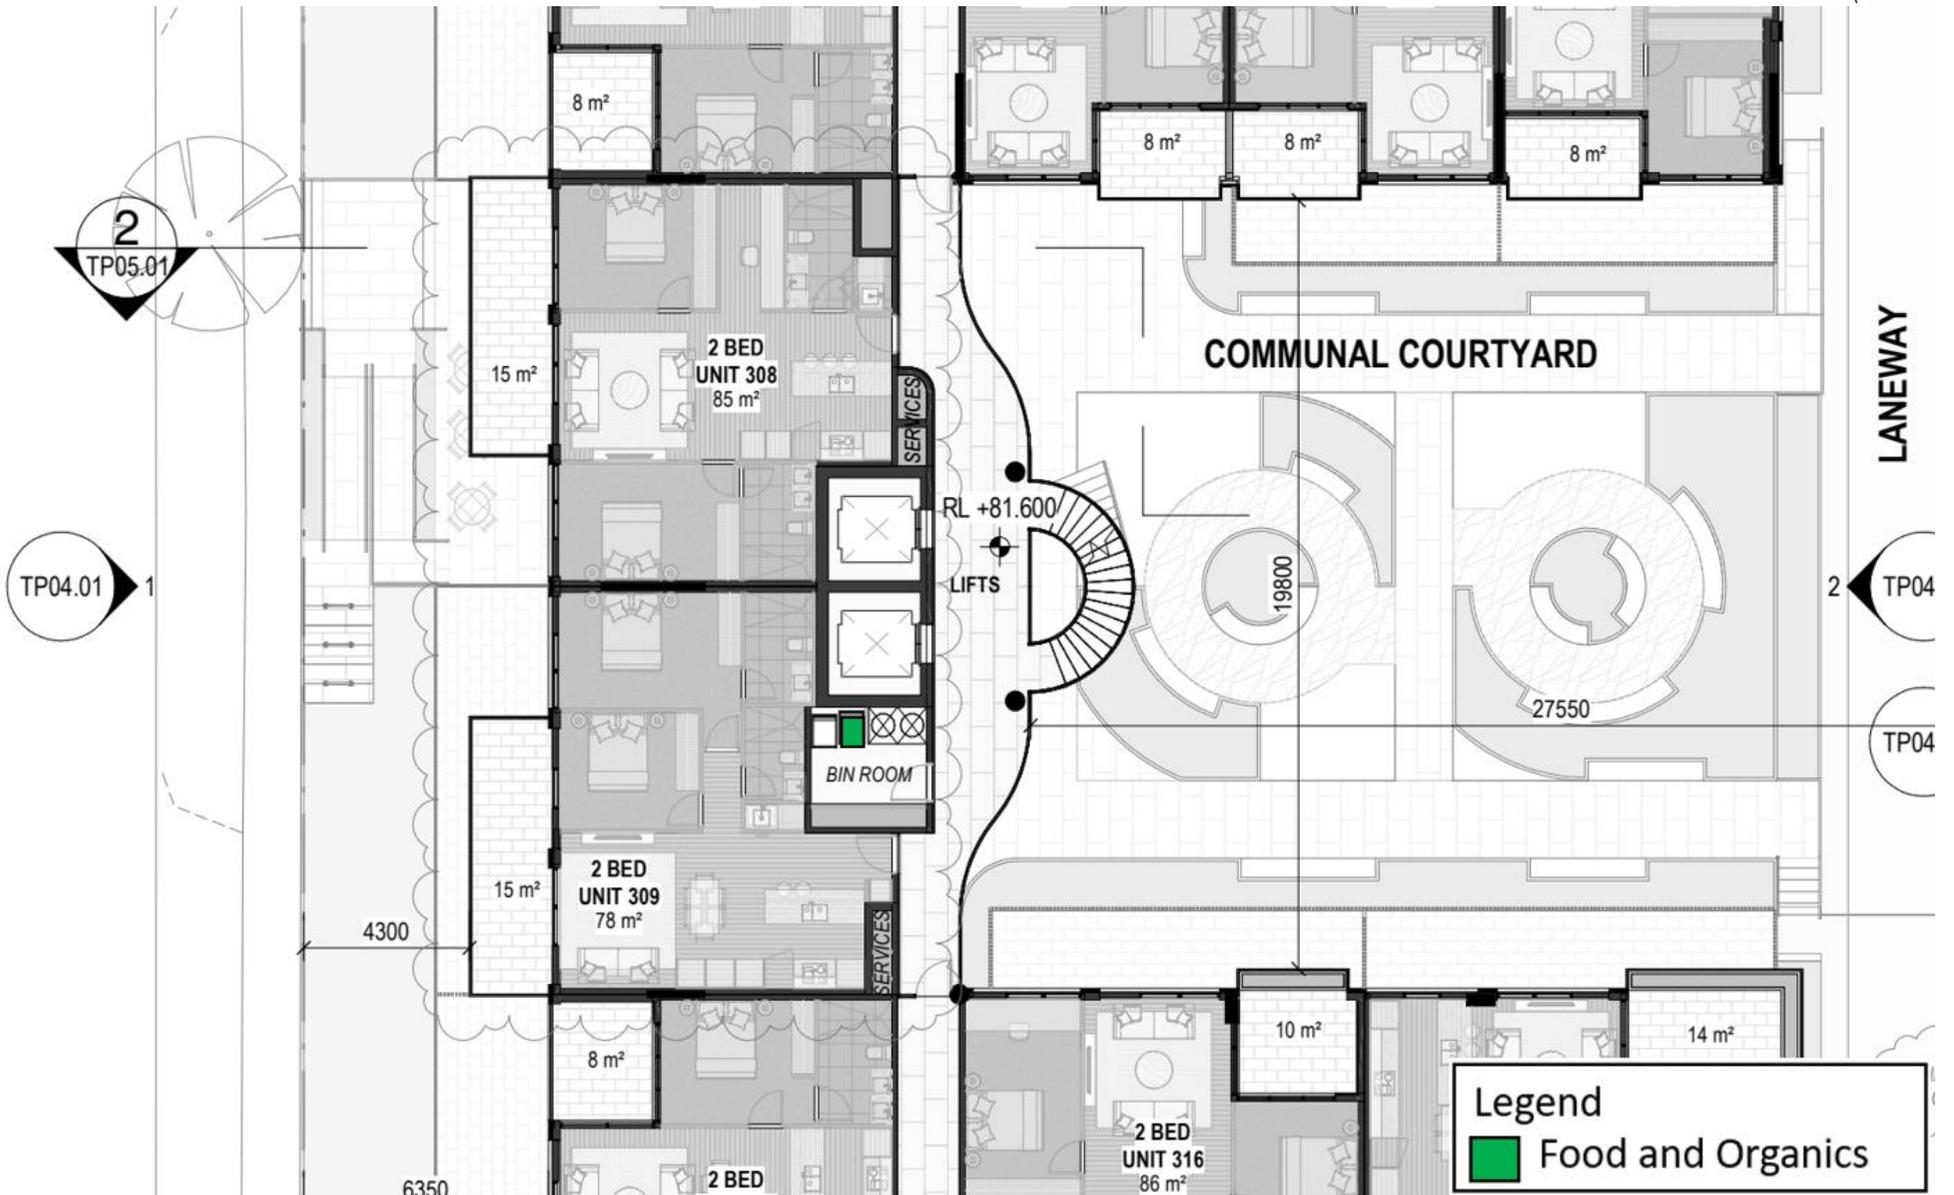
DEVELOPMENT PLAN – THIRD FLOOR BIN STORAGE AREA – CURRENT
